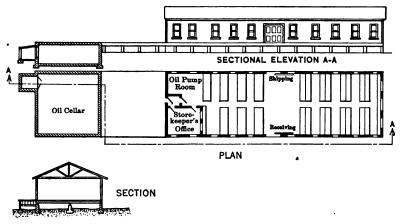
R. S. A. Arrangement of Sub-storehouse.
